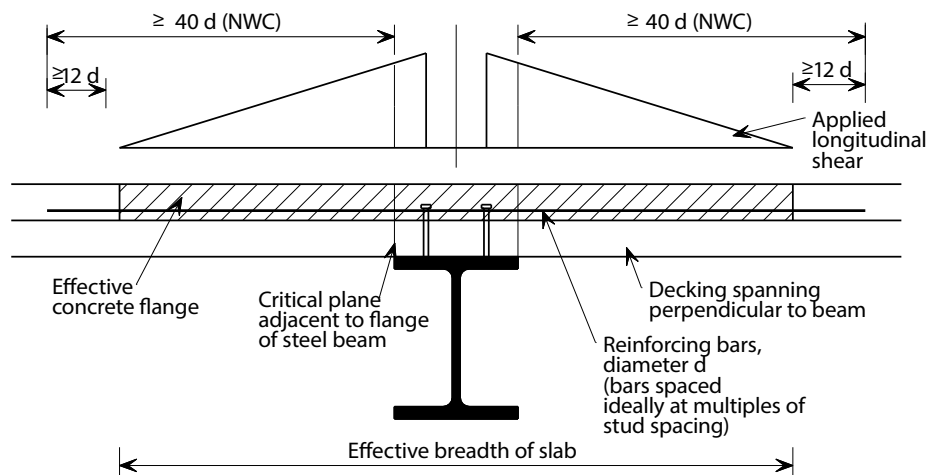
Assumed pattern of transverse shear stresses and anchorage lengths, beam with transverse decking
